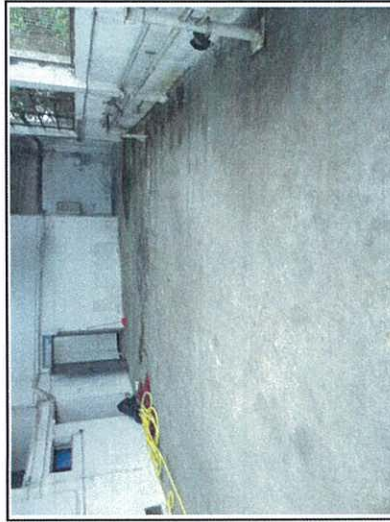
The floor slab of the Ground Floor was concrete paved with no crack. An oil layer (about 1m x 1m) was found in eastern corner but it was a localized spot. The concrete floor slab with oil stain will be disposed of as chemical waste.
